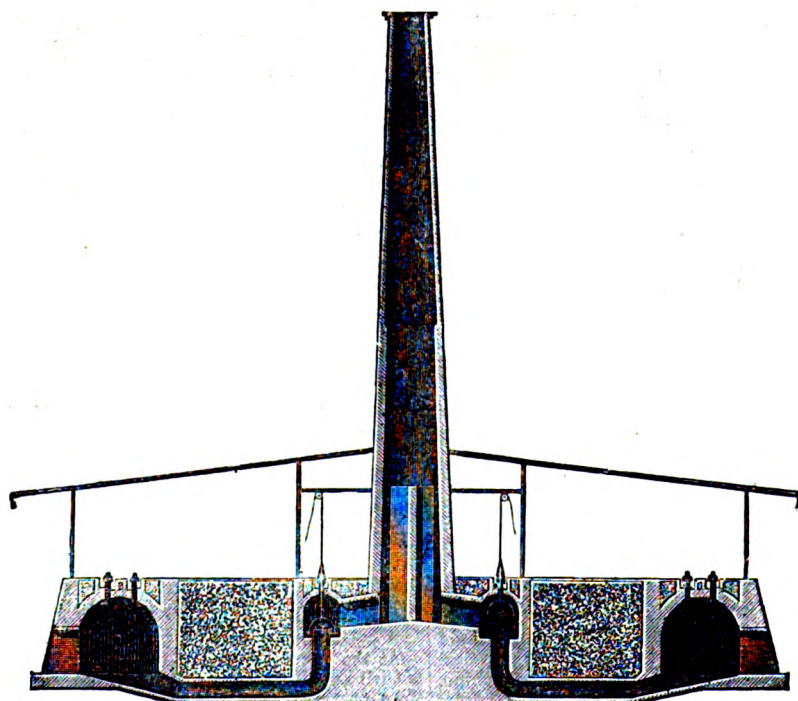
SECTIONAL ELEVATION OF ANNULAR KILN.
